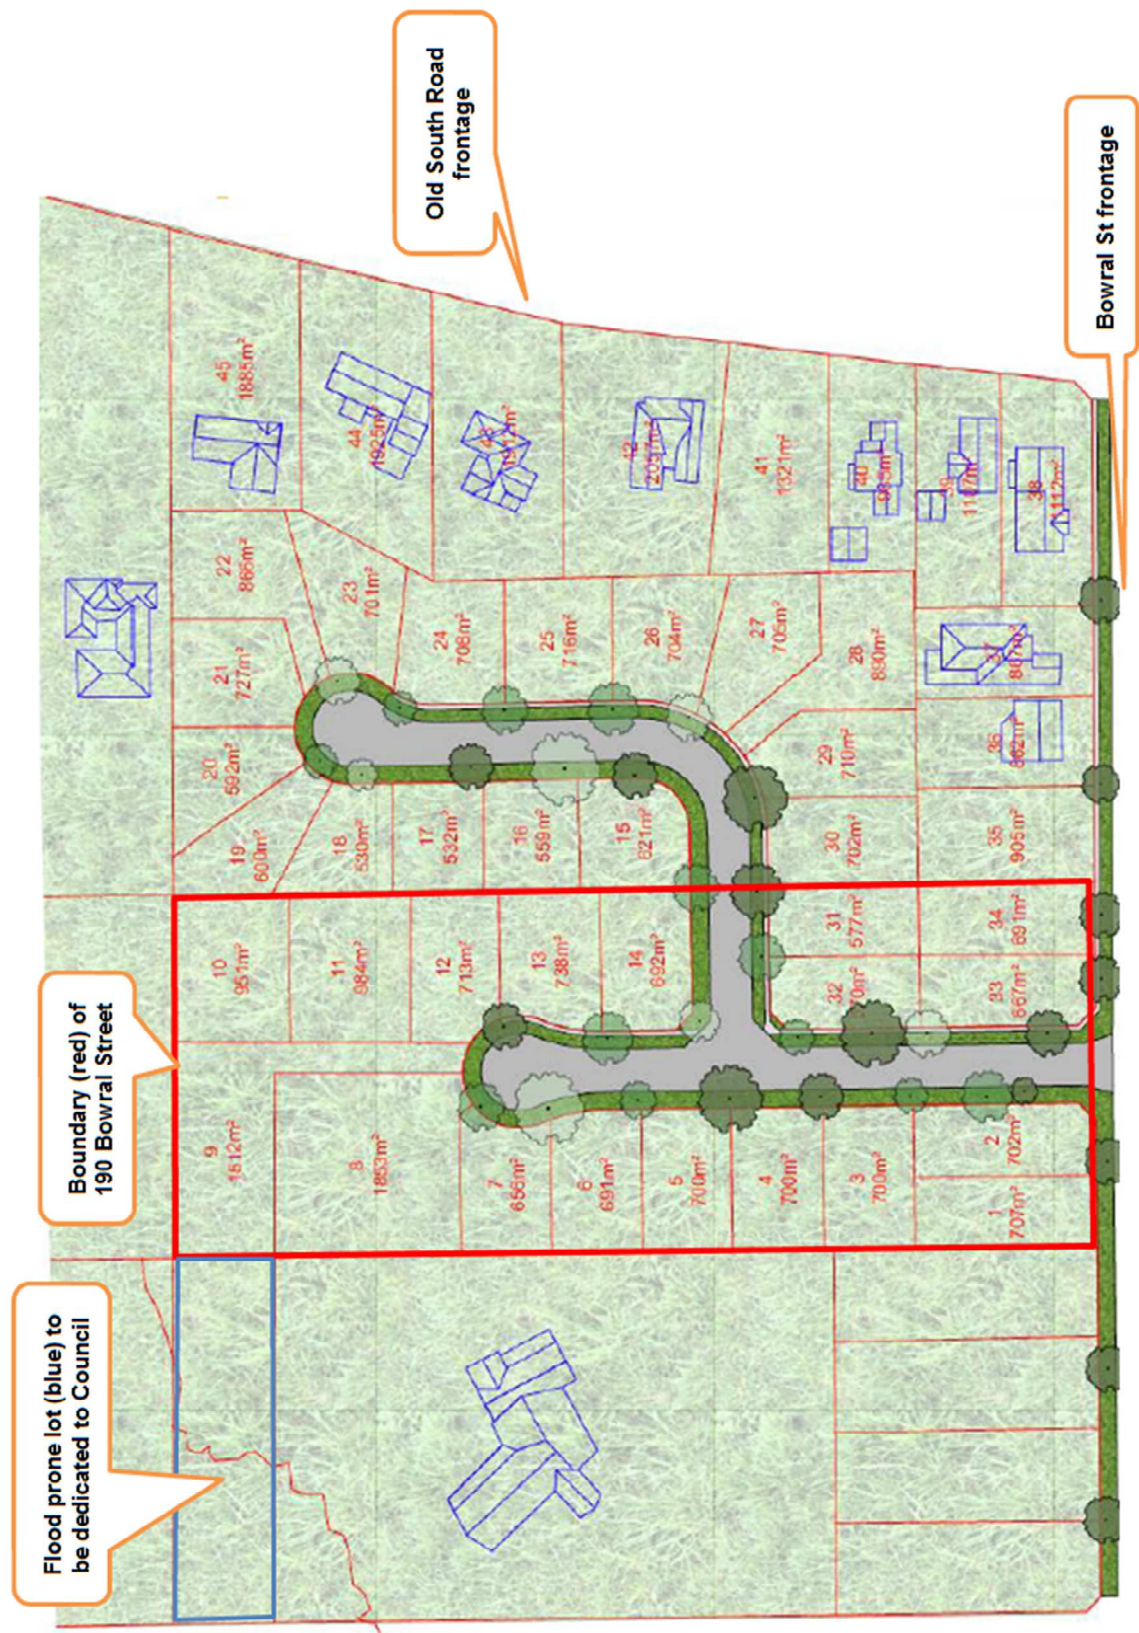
Potential plan of subdivision from Planning Proposal submission (enlarged at Attachment 9)
